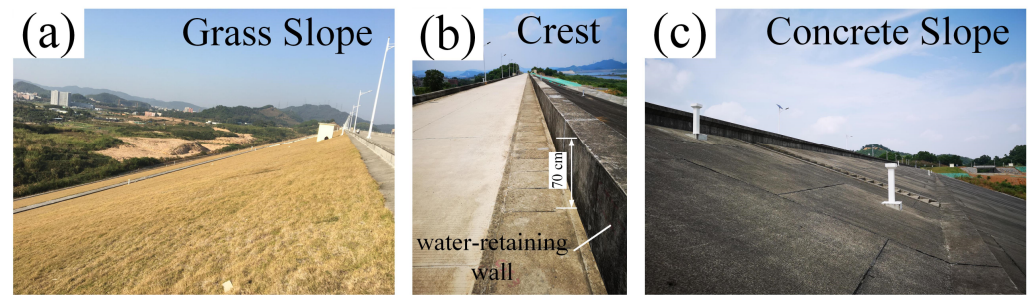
Images of the dam surface of the reservoir. (a) Image of the grass-planted slope. (b) Image of the crest. (c) Image of the concrete slope.
